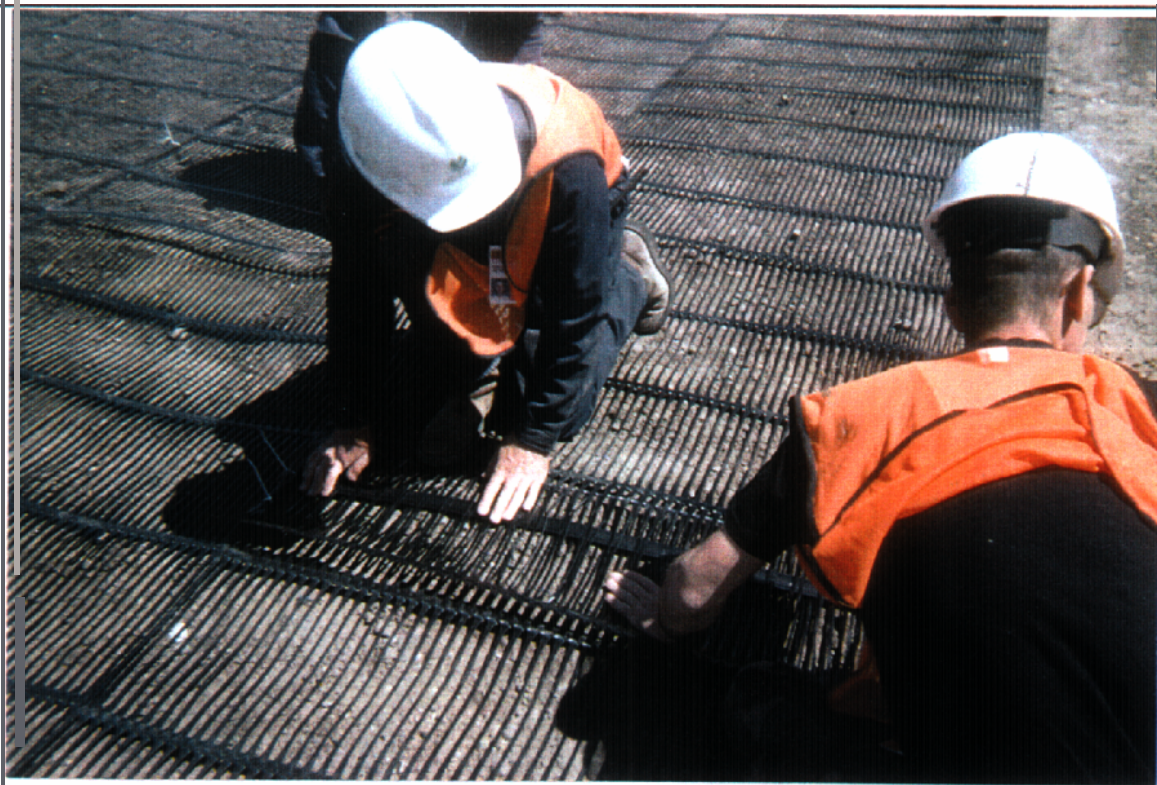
Installing Bodkin Bars at butt seams of geogrid.
